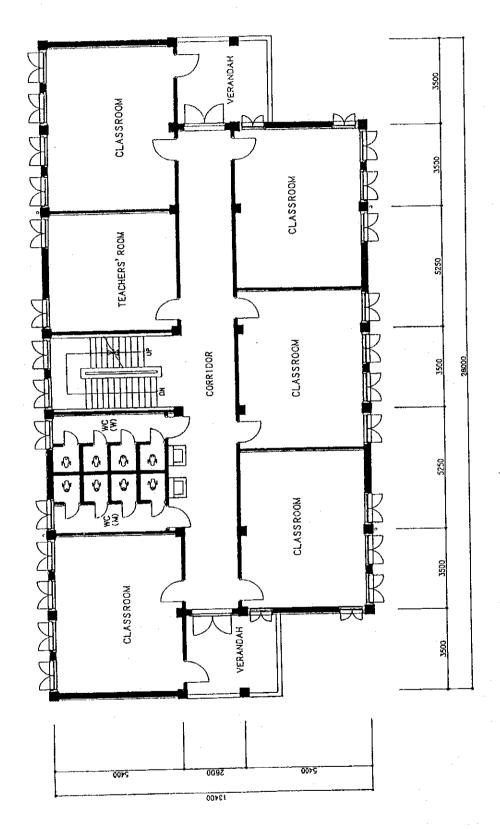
(2) FIRST FLOOR PLAN (5-CLASROOM TYPE)
